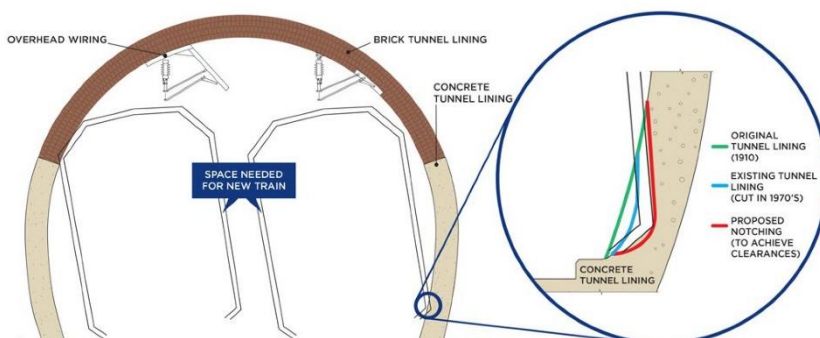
Tunnel cross-section and Kinematic Envelope (KE) interface with wall
